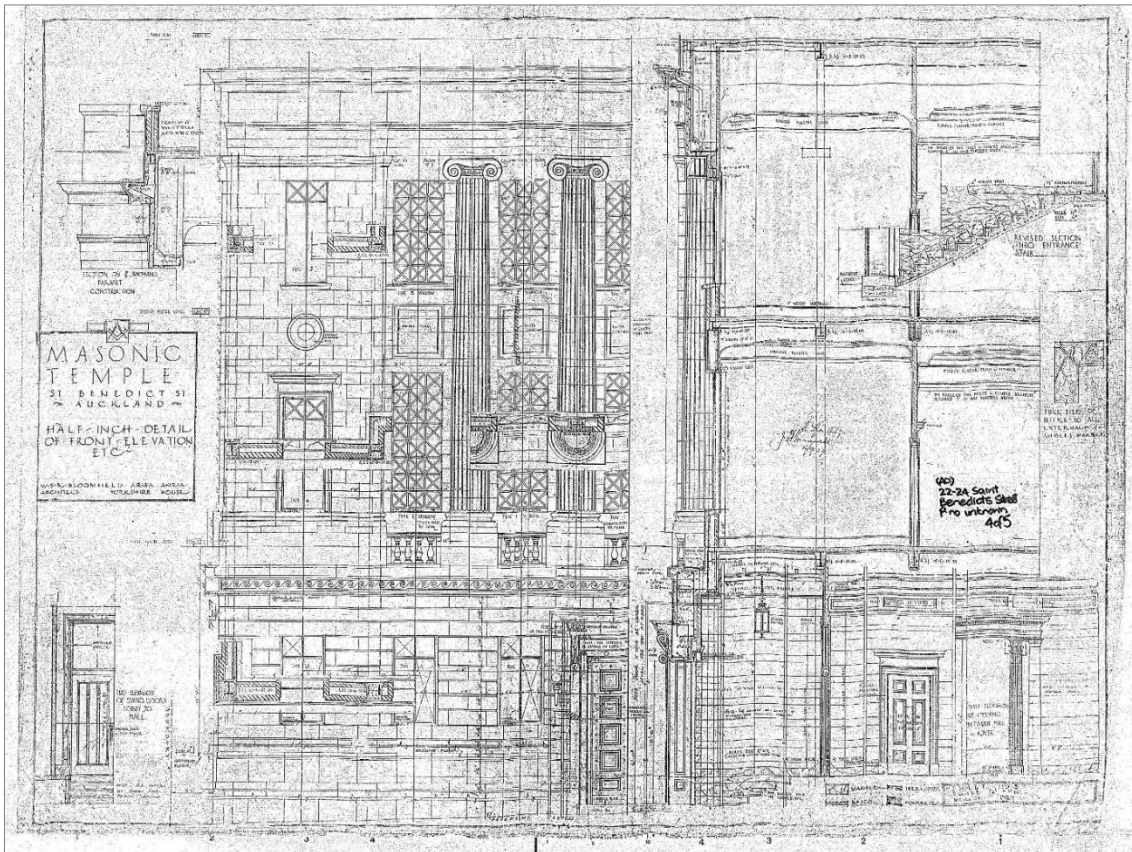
1929 Drawings for 'MASONIC TEMPLE' - by W. S. R. Bloomfield, Architect: Half Inch Detail of Front Elevation. Auckland Council Property File. Accessed March 2022
